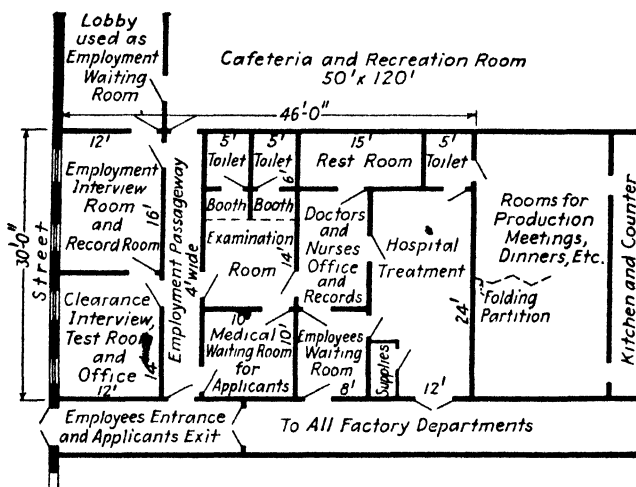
A well arranged layout for the employment and medical departments of an industrial plant. The Ballinger Company, Architects and Engineers. (Courtesy of *The Architectural Forum*.)
